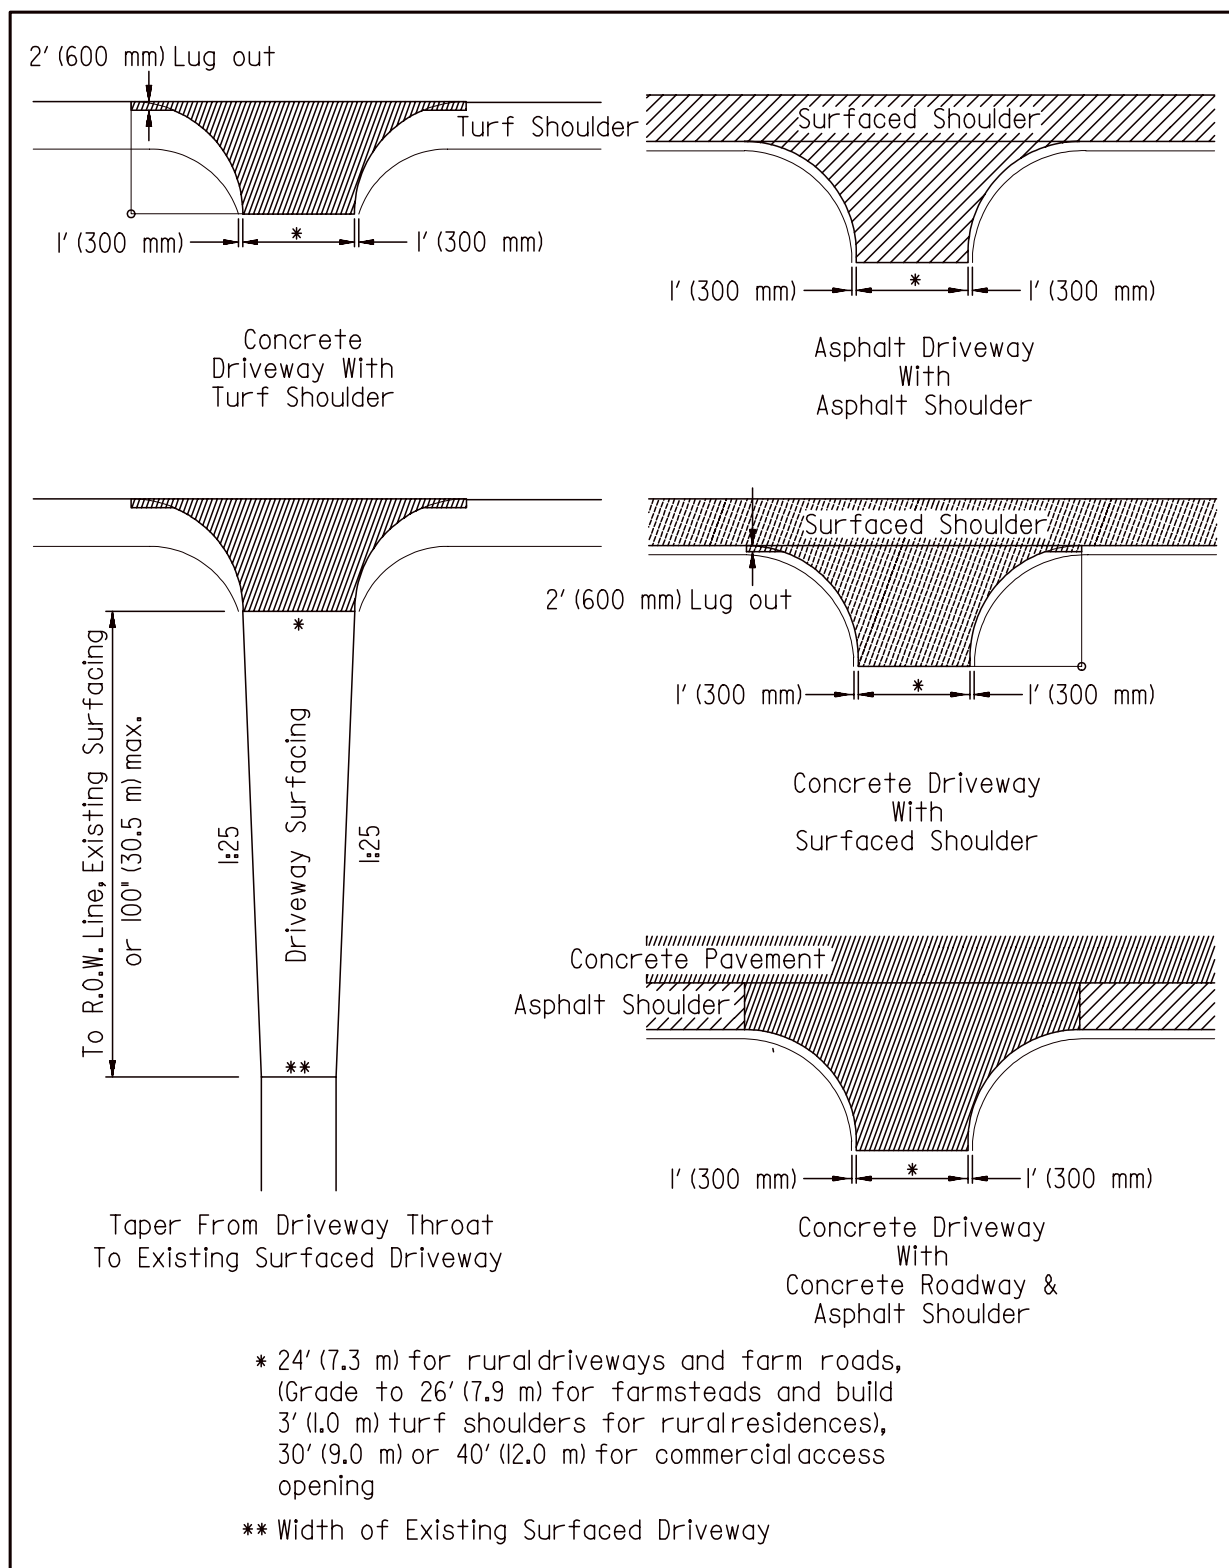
Surfacing Criteria for Rural Driveways
